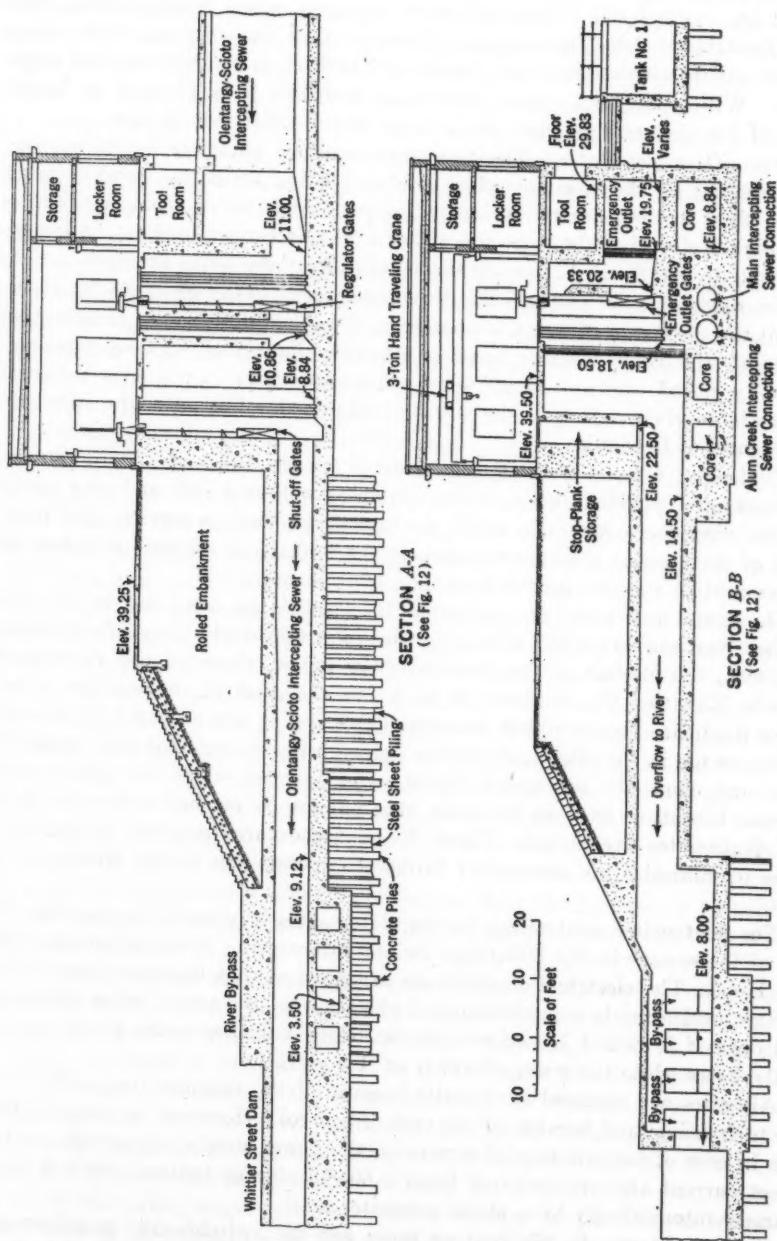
SECTIONS OF CONTROL WORKS AT WHITTIER STREET STORM STAND-BY TANKS.
